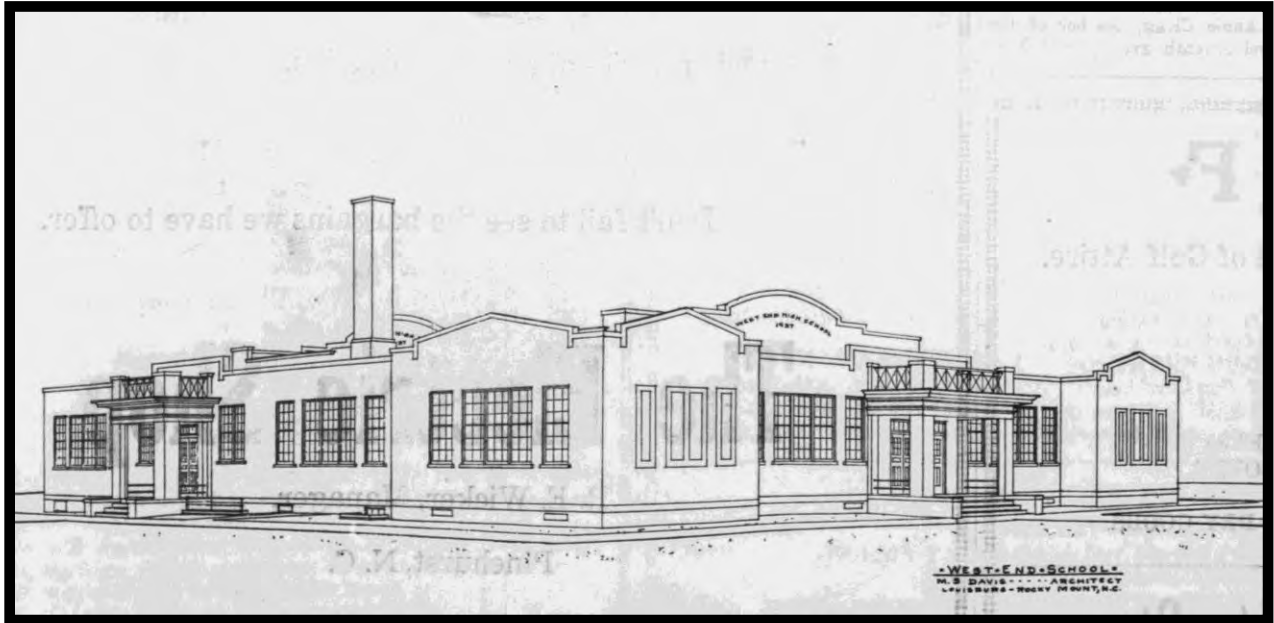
Architect's Drawing of West End High School (Pilot 1927).
